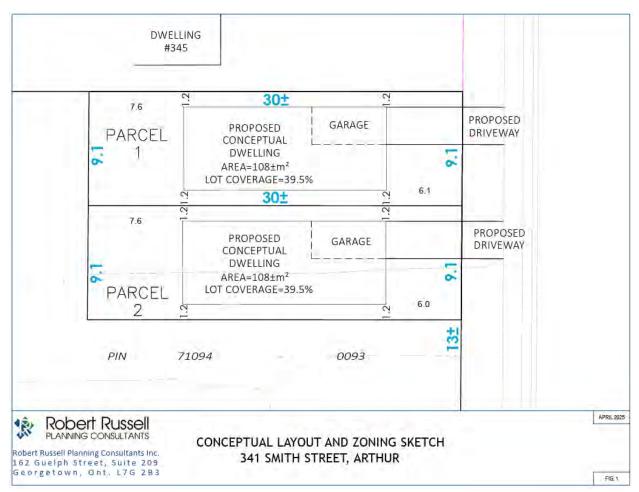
A Site Plan prepared by Robert Russell Planning Consultants.
